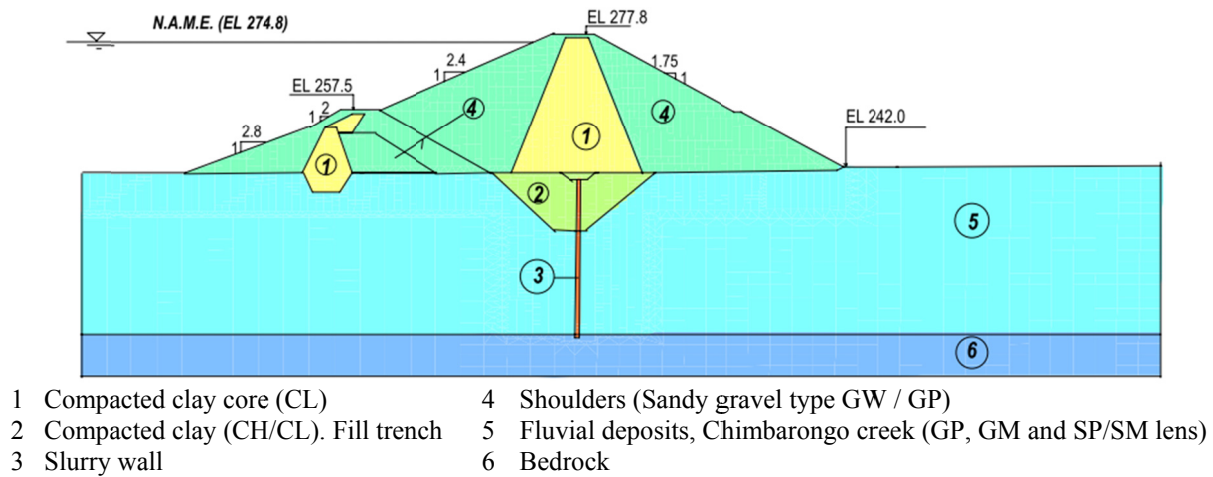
Cross section of the earth dam (ARCADIS Geotecnia, 2002)
